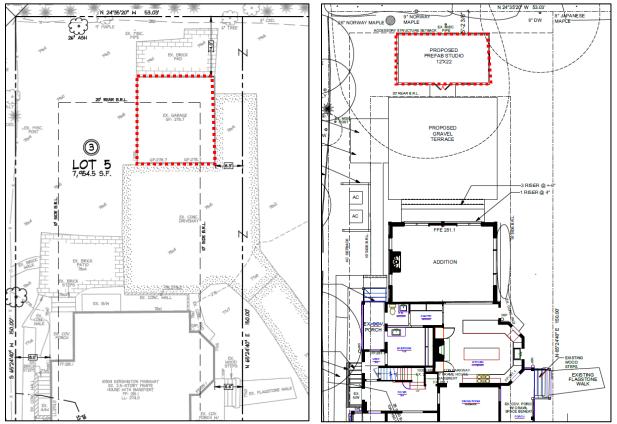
Site plan for the demolition of the existing garage reviewed in 2022 (left) and the site plan for the subject proposed accessory building (right). The locations of the existing garage and proposed accessory building are outlined in red.
